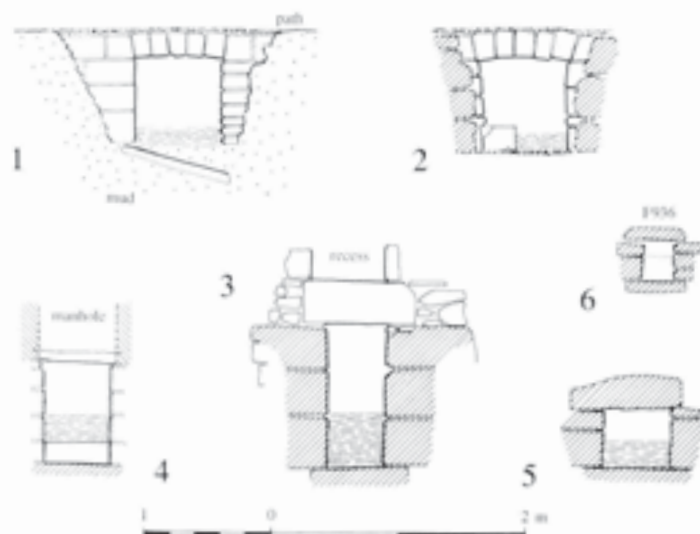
Sections through conduits. 1 East elevation of the early nineteenth-century bridge adjacent to St Andrew's Well; 2 West elevation of the same; 3 Section of Bekynton's conduit beneath the Camery wall; 4 Section of the same at sluice 'H'; 5 Section through Stillington's conduit in Area 5; 6 Overflow channel in Area 8. See plan, Fig. 395. Scale 1:60
